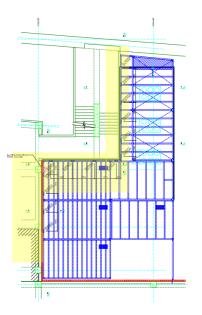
Existing steel frame supporting plant located on top of manufacturing pharmacy roof (LGF level)
